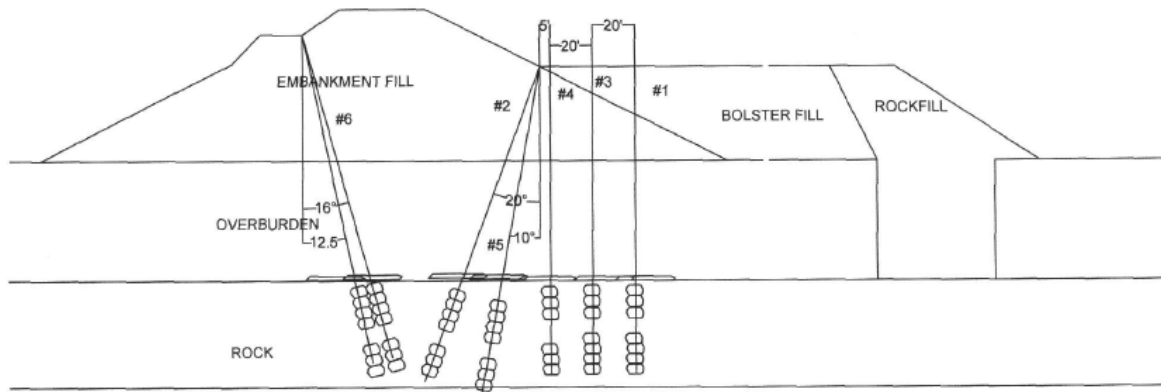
Final Configuration of LMG Column Layout at Each Station (not to scale)
